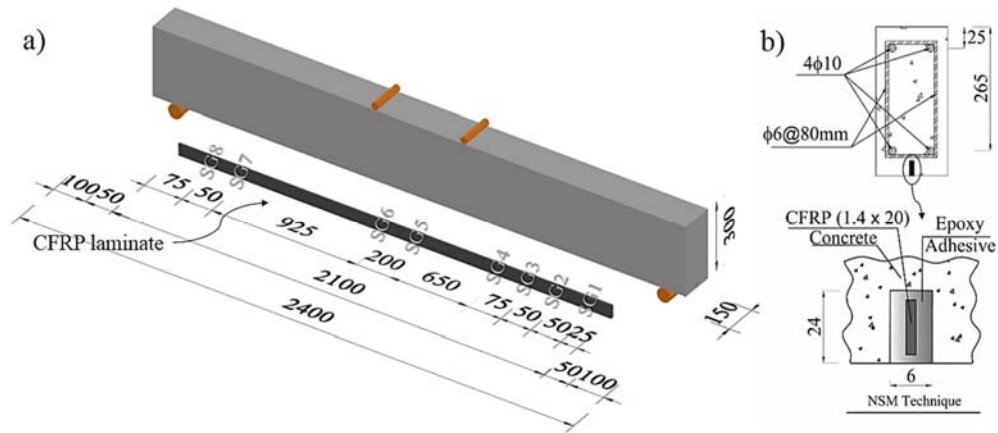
The beams of the experimental program: a) geometry and position of strain gauges (SG) installed on the CFRP laminate; b) steel and CFRP reinforcements (dimensions in mm)
